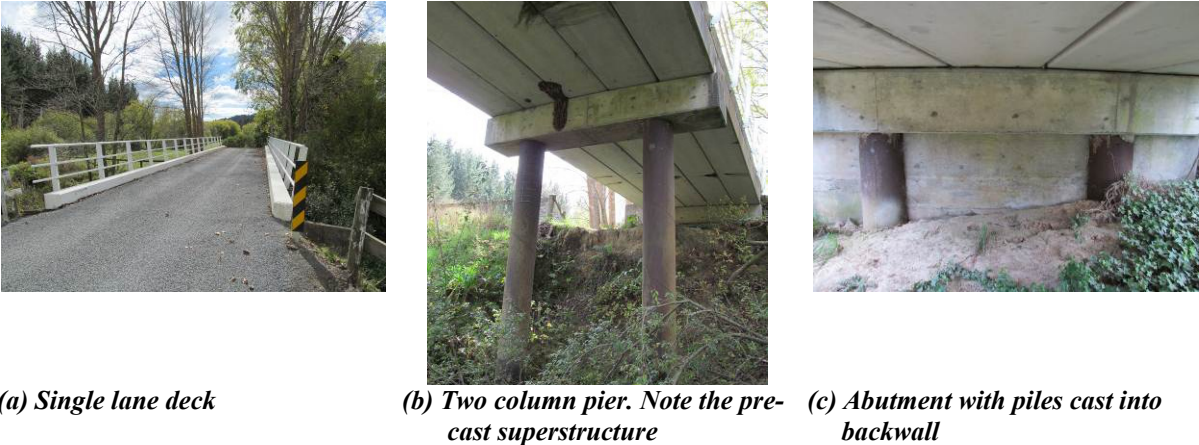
Caitcheon’s Bridge superstructure and substructure configuration.
